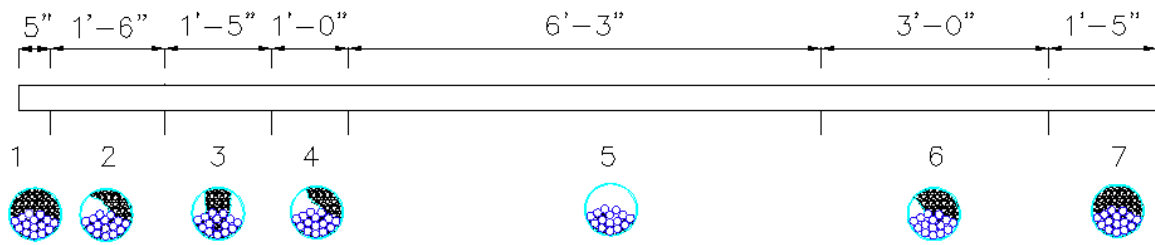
Visual Inspection of 19S20PC-10 PC after grout removal
